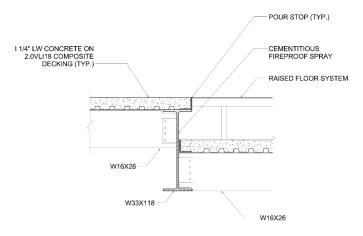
DIFFERENTIAL SLAB ELEVATION NORTH-SOUTH
